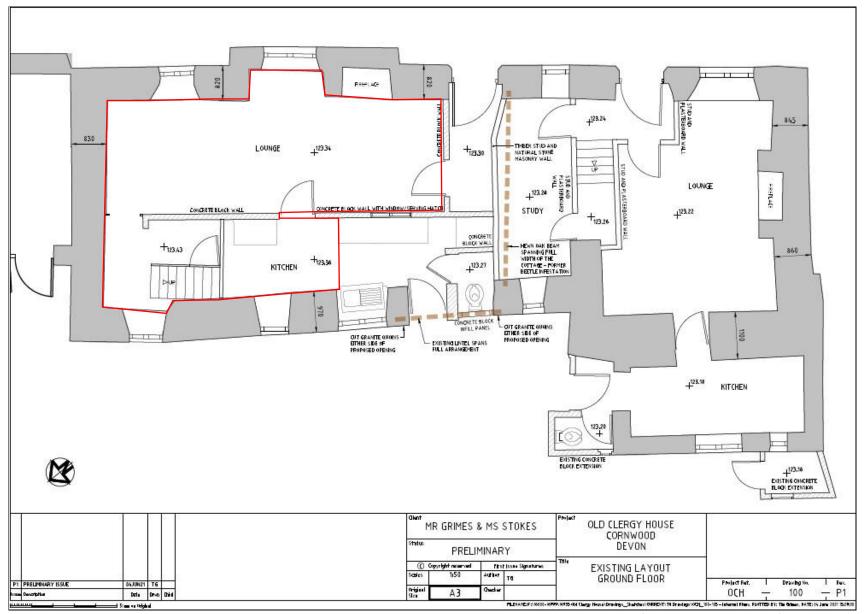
THE EXISTING FLOOR PLAN OF THE BUILDING, SHOWING THE SPACE WHERE THE BUILDING RECORDING TOOK PLACE; (AS SUPPLIED BY CLIENT, 2022).
